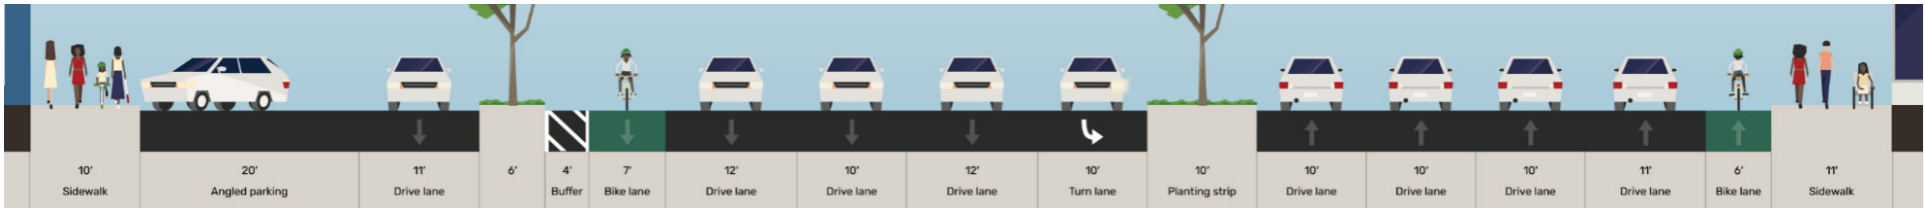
Existing cross-section: Hawthorne Blvd from W 120th St to W Broadway
